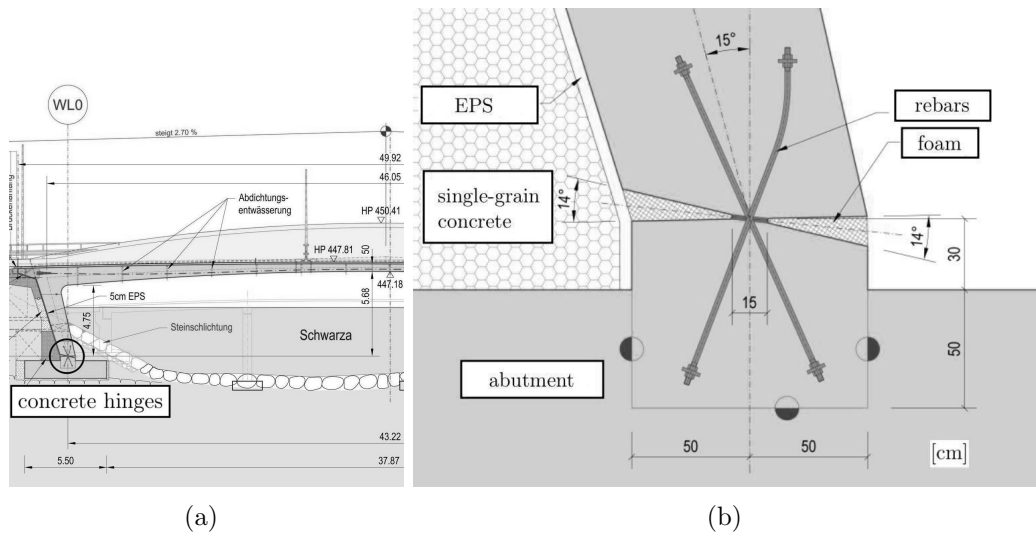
(a) One half of the longitudinal section, taken from [20], showing the positions of the reinforced concrete hinges, and (b) vertical section through one of the concrete hinges, showing the reinforcement crossing the neck [21]
